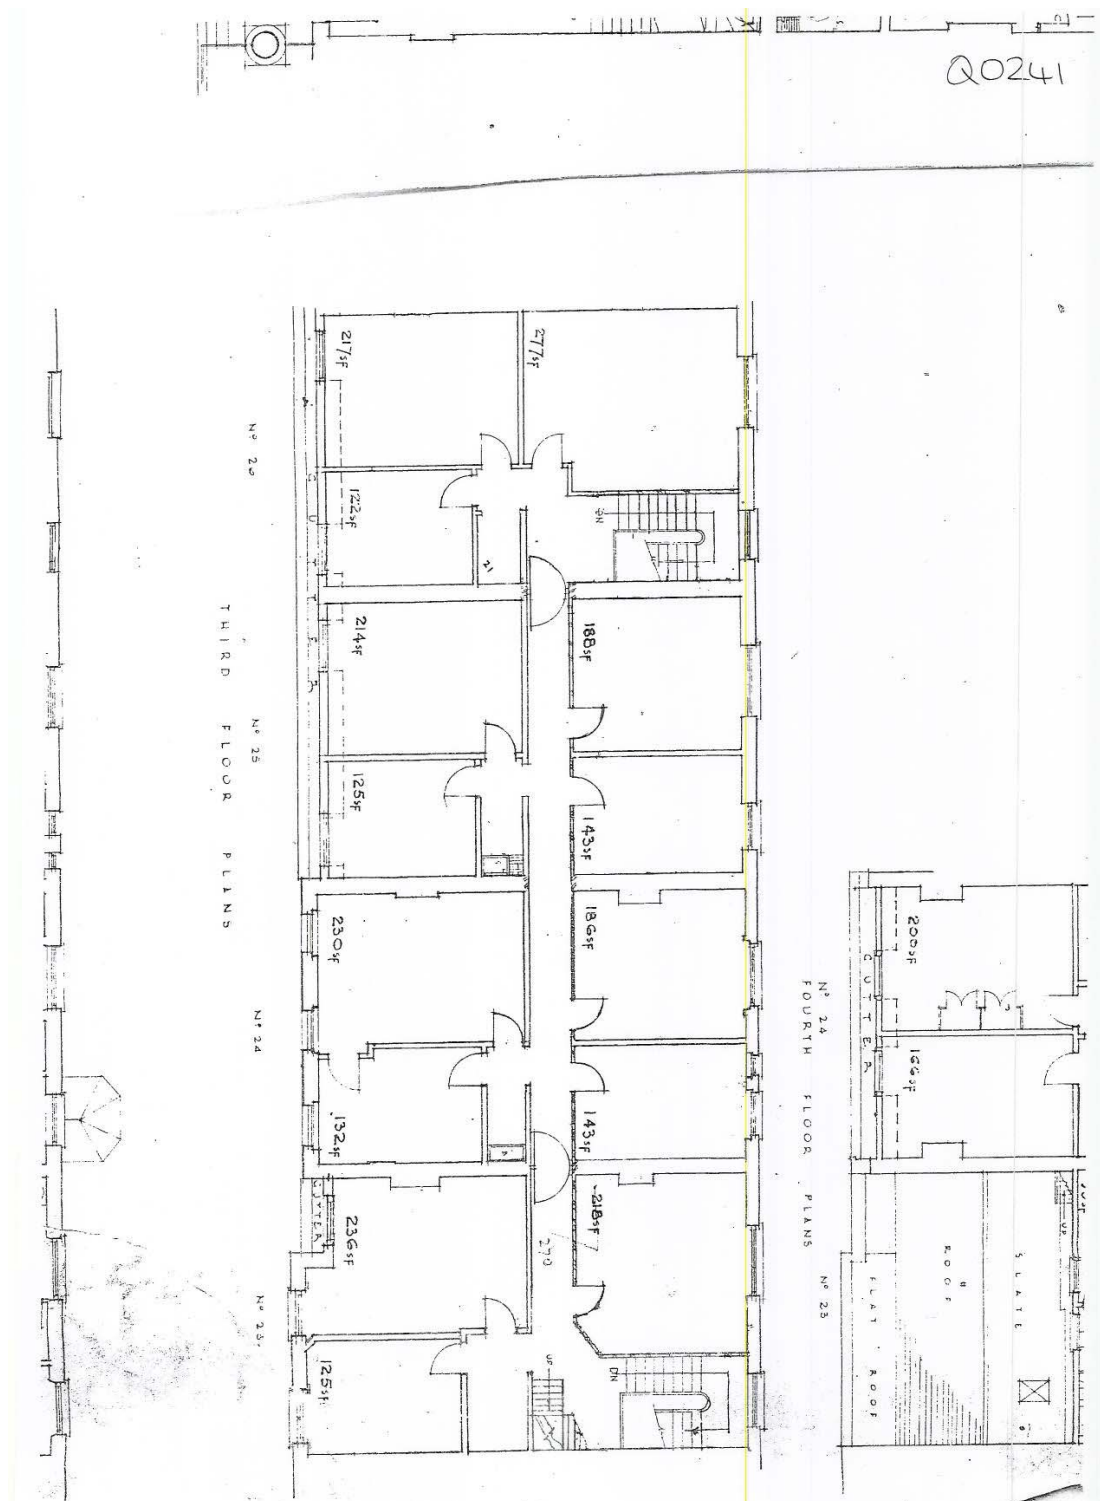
Extract from Ministry of Works Plans April 1946 Third Floor Plans Nos: 26 – 23 Chester Terrace – The Crown Estate Archives
